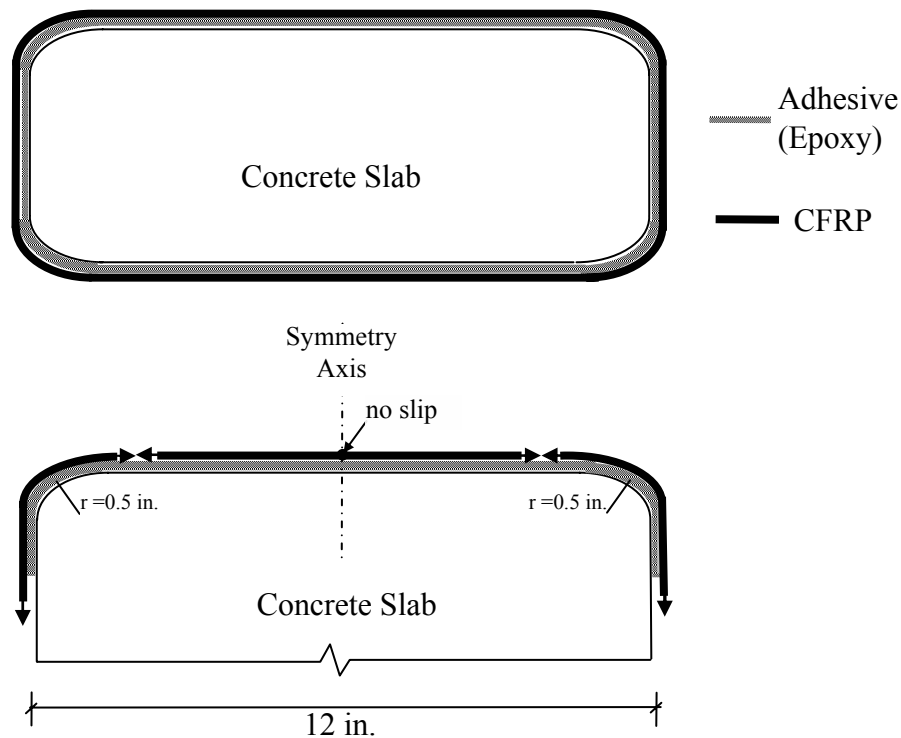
Closed CFRP Loops Used as Shear Reinforcement
